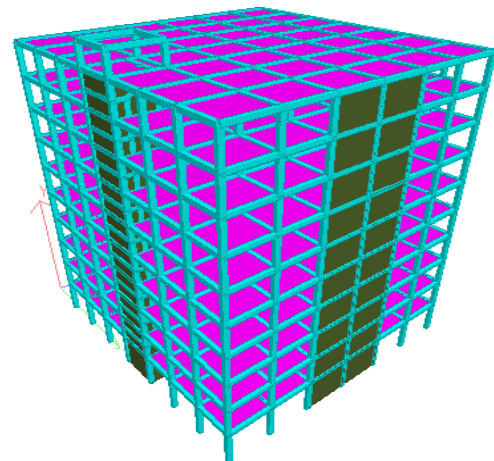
D VIEW OF CONVENTIONAL SLAB WITH SHEAR WALL IN Z DIRECTION.
